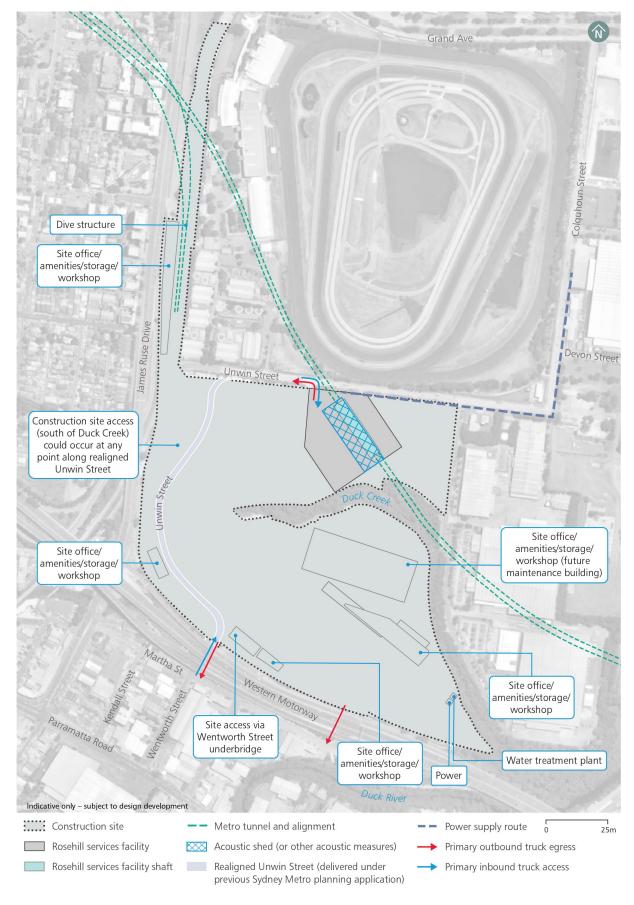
Clyde stabling and maintenance facility and Rosehill services facility indicative construction site layout
